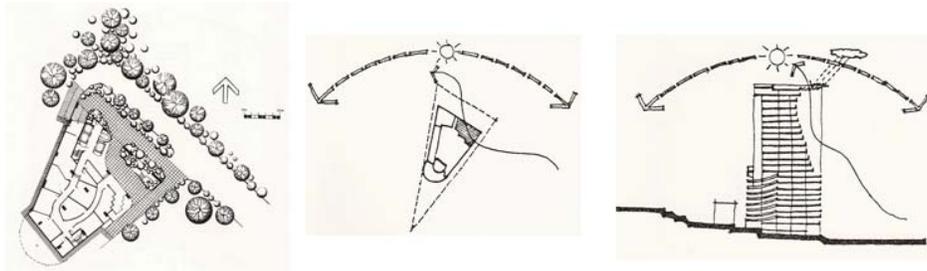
Site of the Building with Sun Path.¹⁶⁷
